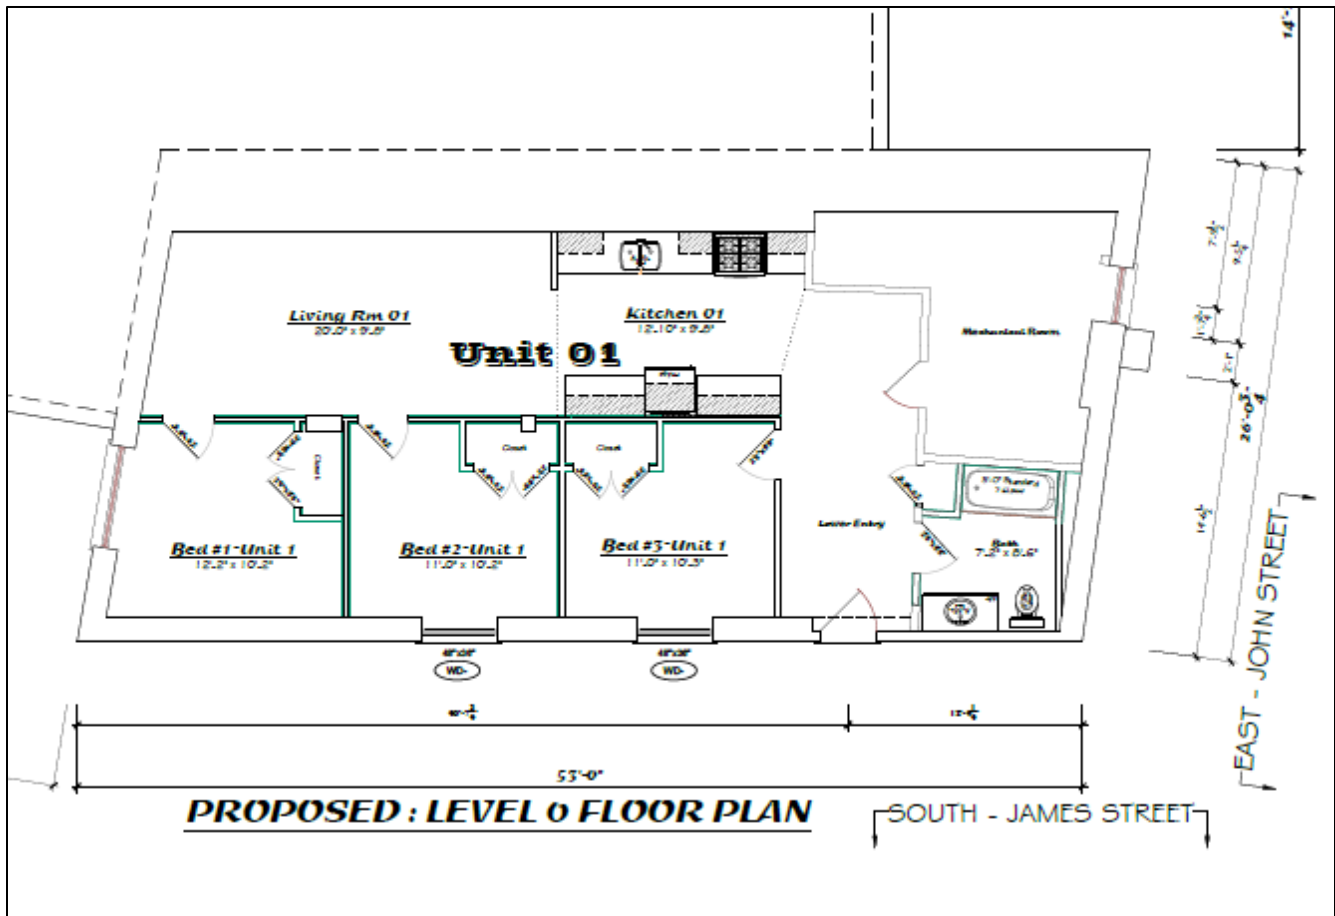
Floor Plan, Basement (Source: Annable Designs)
